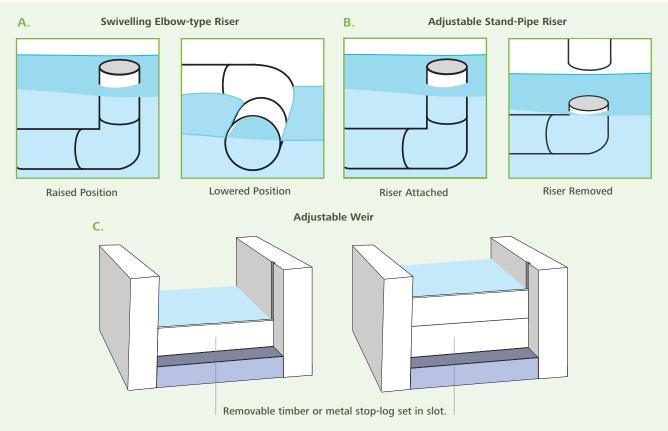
Examples of outlet structure design where providing for fish passage is not required. (A) swivelling elbow-type riser, (B) adjustable riser piper suitable for small wetlands, and (C) adjustable weir suitable for larger constructed wetlands.
